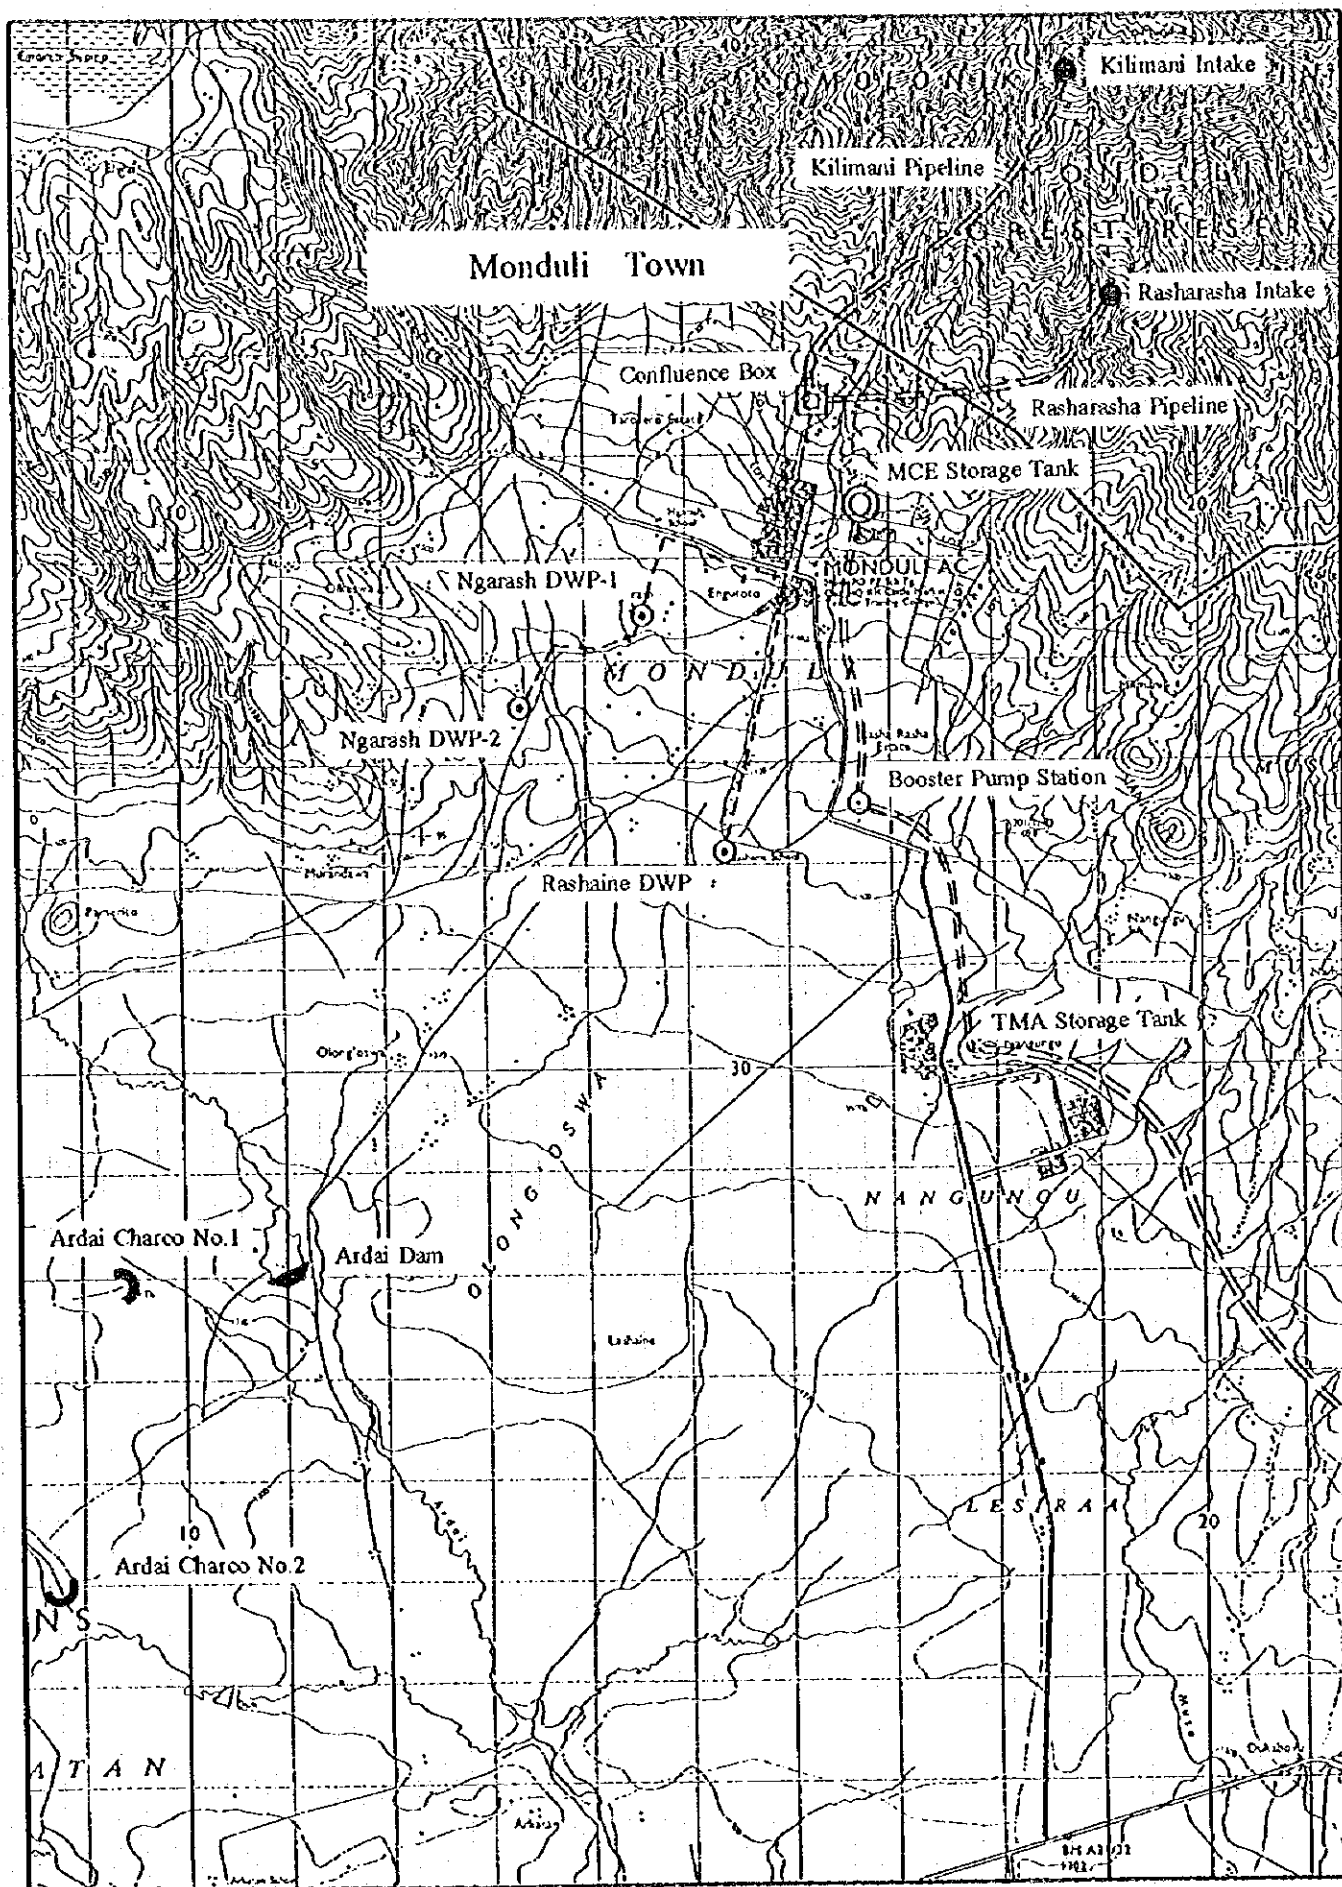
LAYOUT OF PROPOSED MONDULI WATER SUPPLY PROJECT
